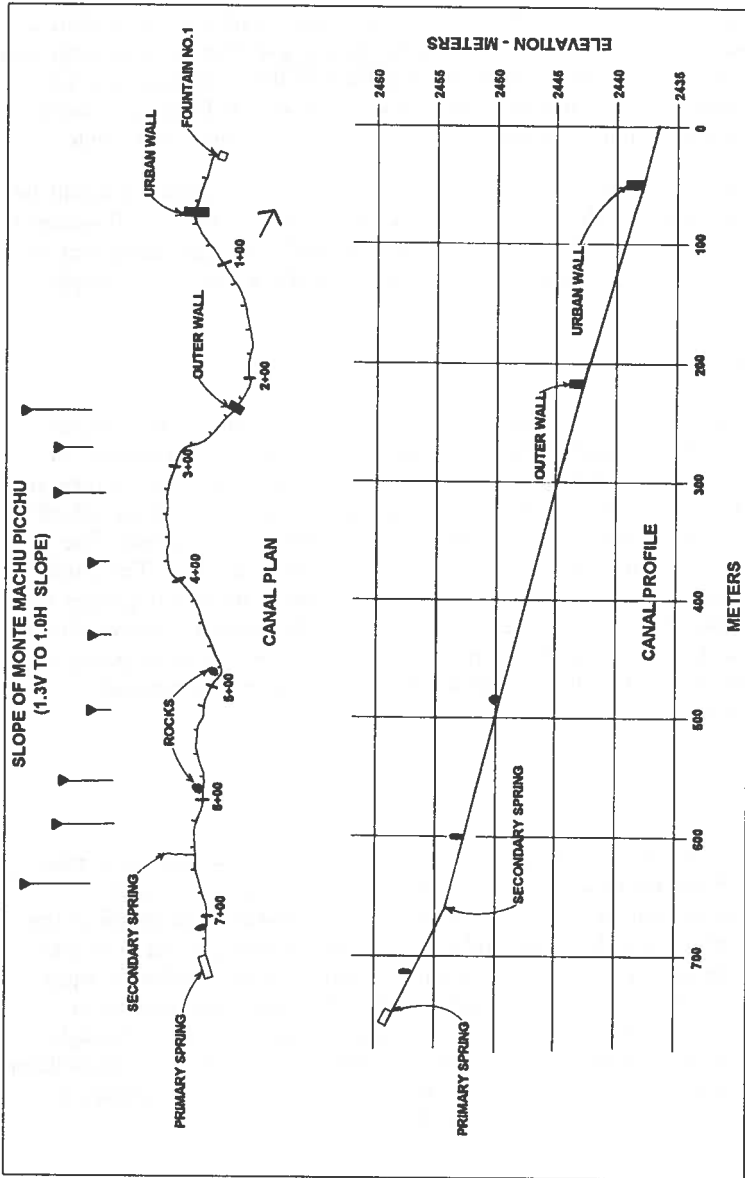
Plan and profile of Machu Picchu domestic water supply works from the Primary Spring to Fountain I.
